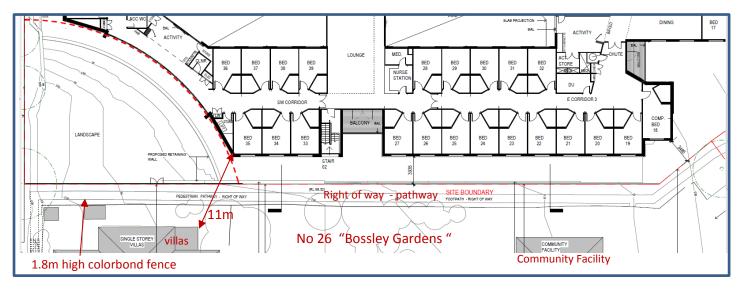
Extract First Floor Plan Source: Jackson Teece
